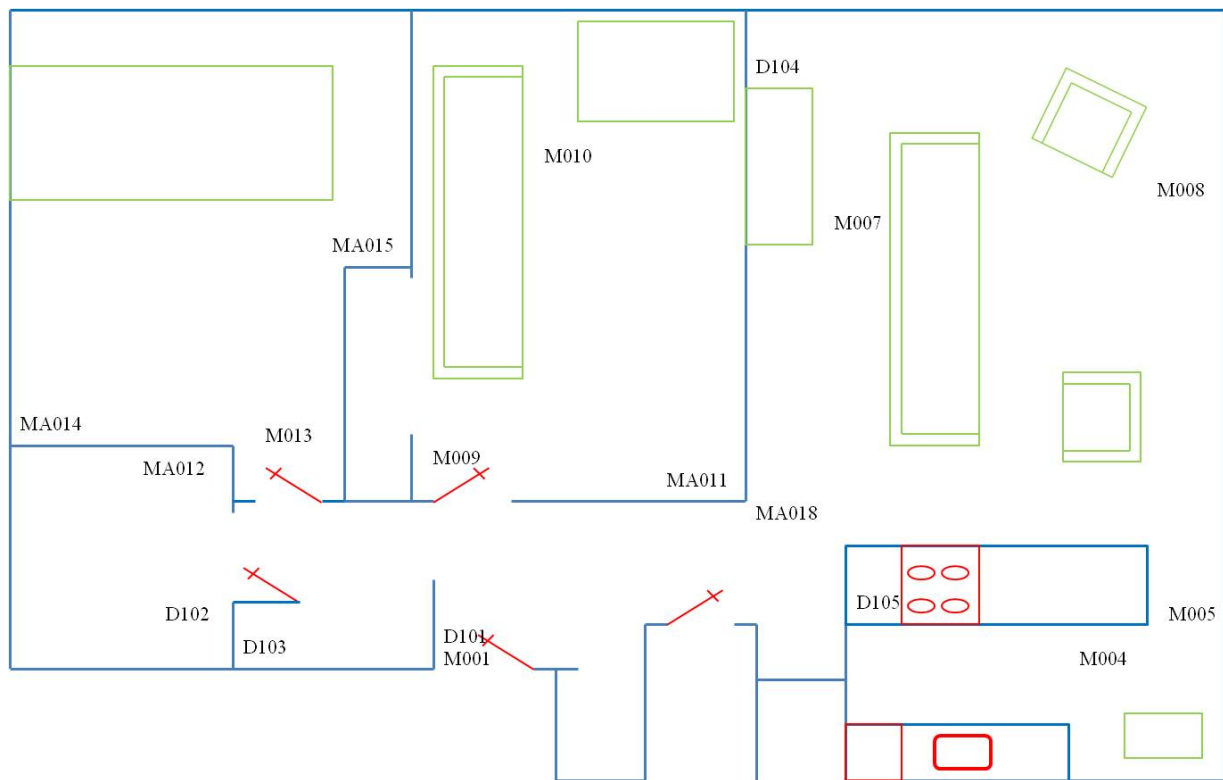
Floor plan and sensor placement for the testbed hh127.
